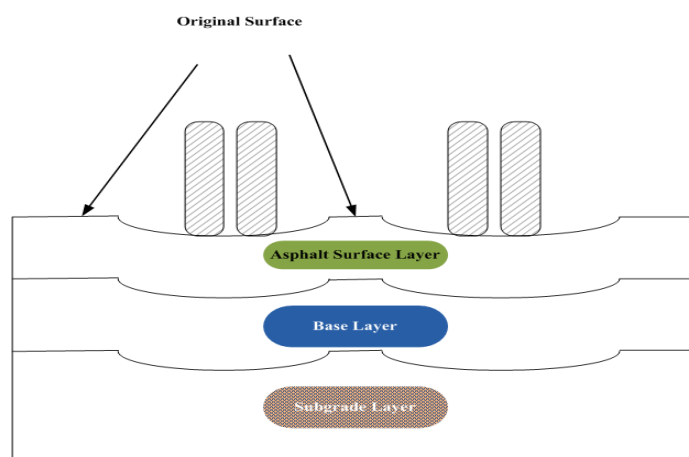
Structural Rutting in Flexible Pavements (Hussain, 2012)
